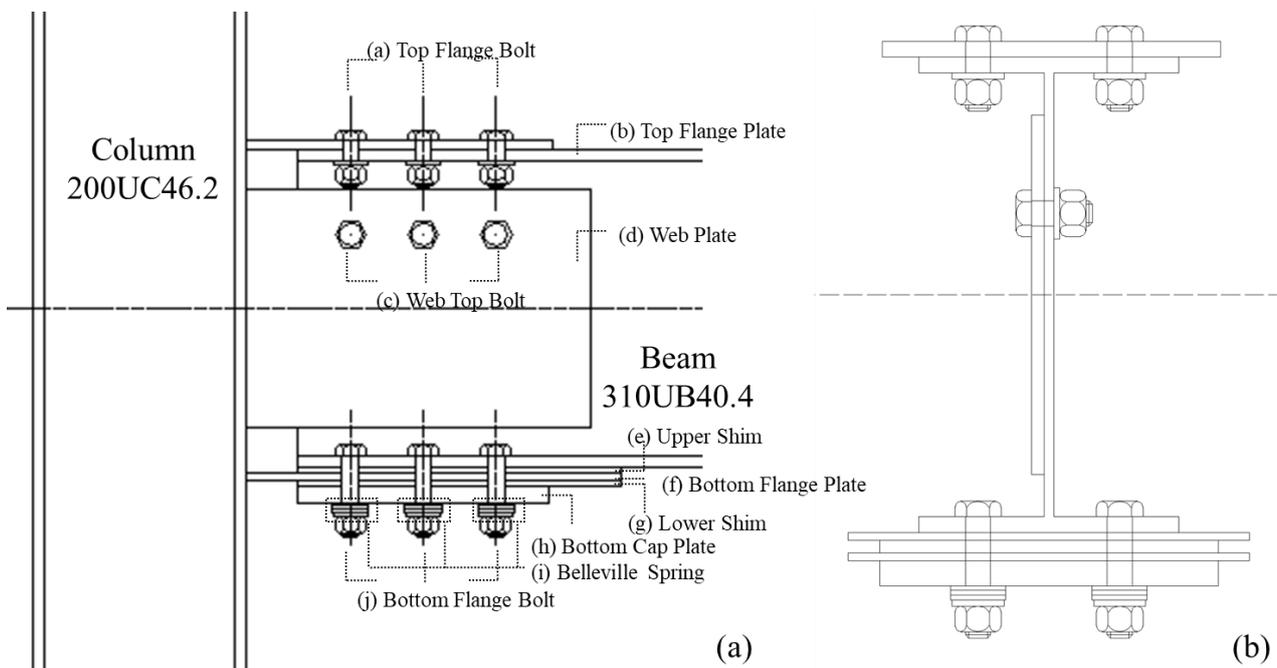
Sliding Hinge Joint Layout (a) Lateral View and (b) Beam Cross Sectional View
